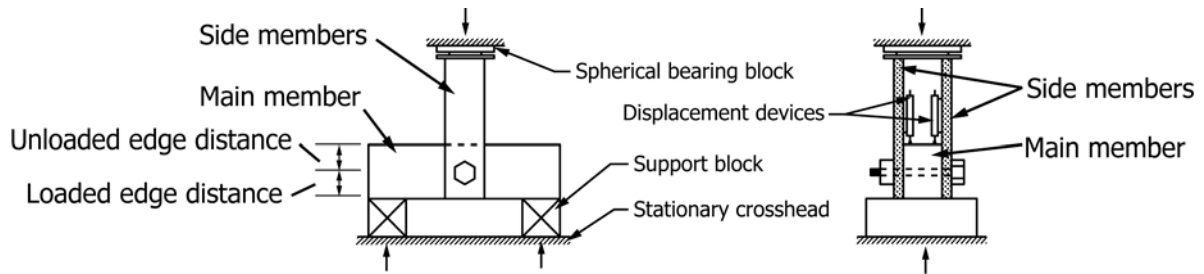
Assembly for Testing Single-Bolt Connections Perpendicular to Grain in Compression
